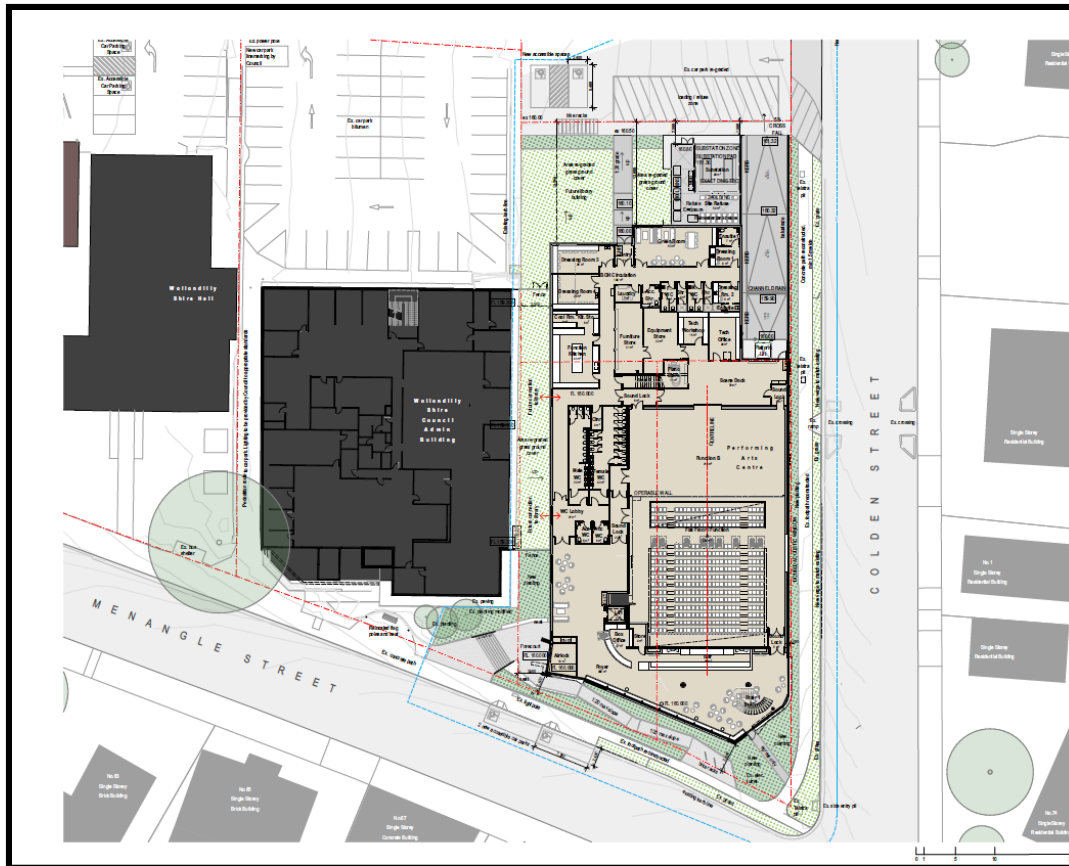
Proposed Ground Floor Plan (Source: William Ross Architects)
